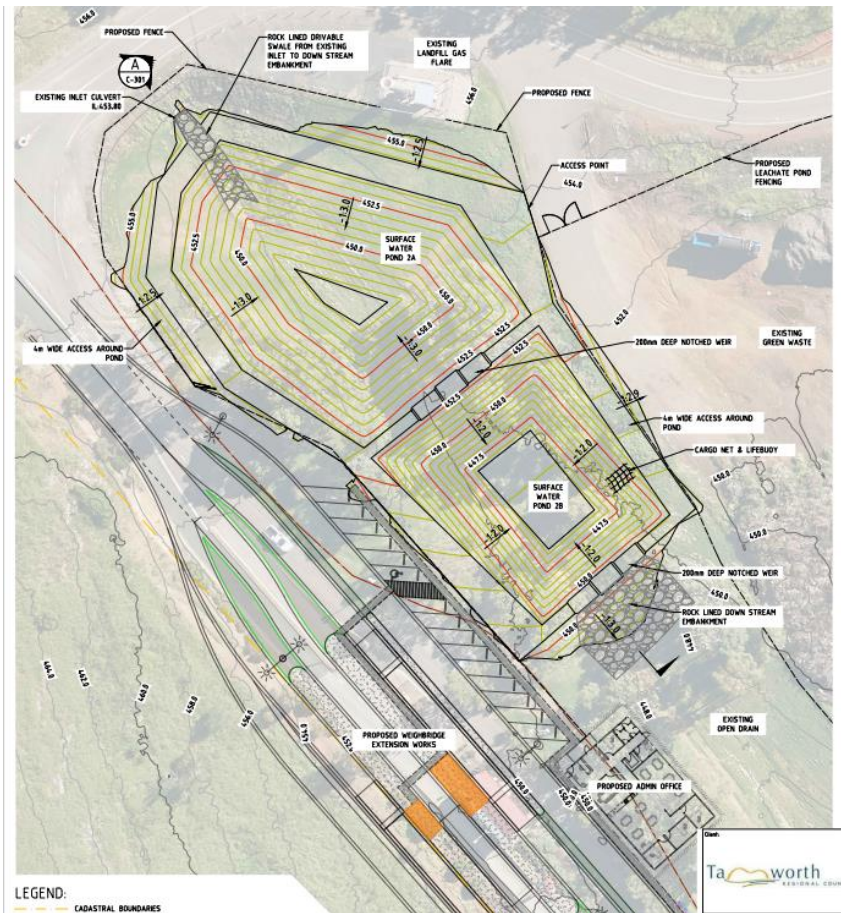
3 Location of Surface Water Pond #2 (Stormwater Pond) - FRL
